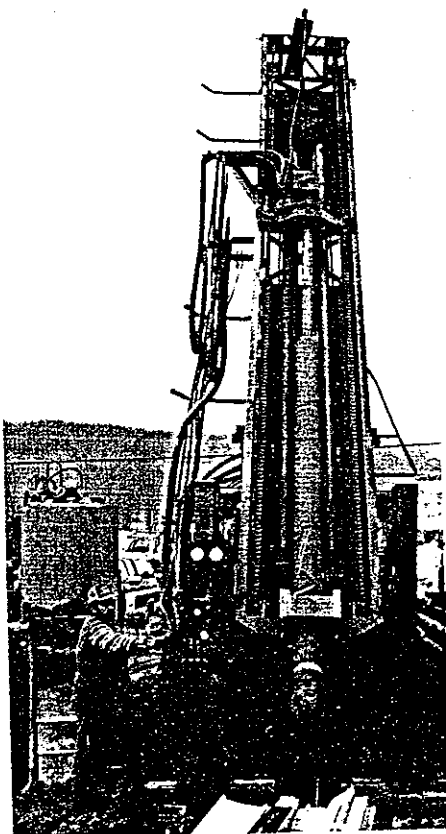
On some direct rotary rigs, a top-head drive is used to rotate the drill string. The amount of torque delivered to the bit by a top-head drive is usually somewhat less than that produced by a table drive, but the rod-handling speed is exceptionally good. (*Olson Brothers Well Drilling*)
